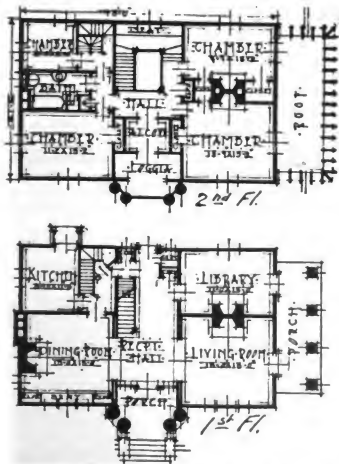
FIRST AND SECOND FLOOR PLANS OF REINFORCED CONCRETE RESIDENCE.
